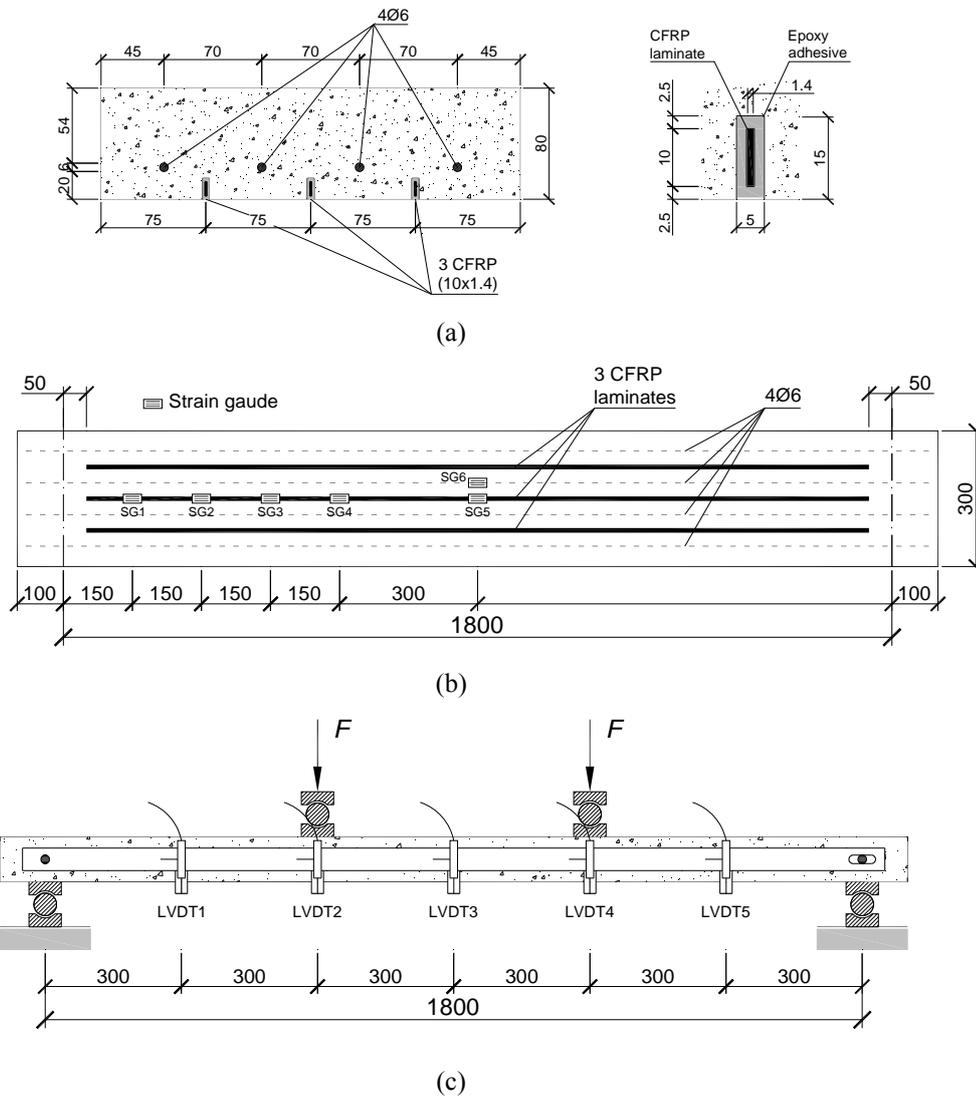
Slab specimens: (a) Cross-section geometry and reinforcement detailing; (b) Longitudinal geometry, reinforcement detailing and gauge instrumentation; (c) Test configuration. Note: all units in [mm].
